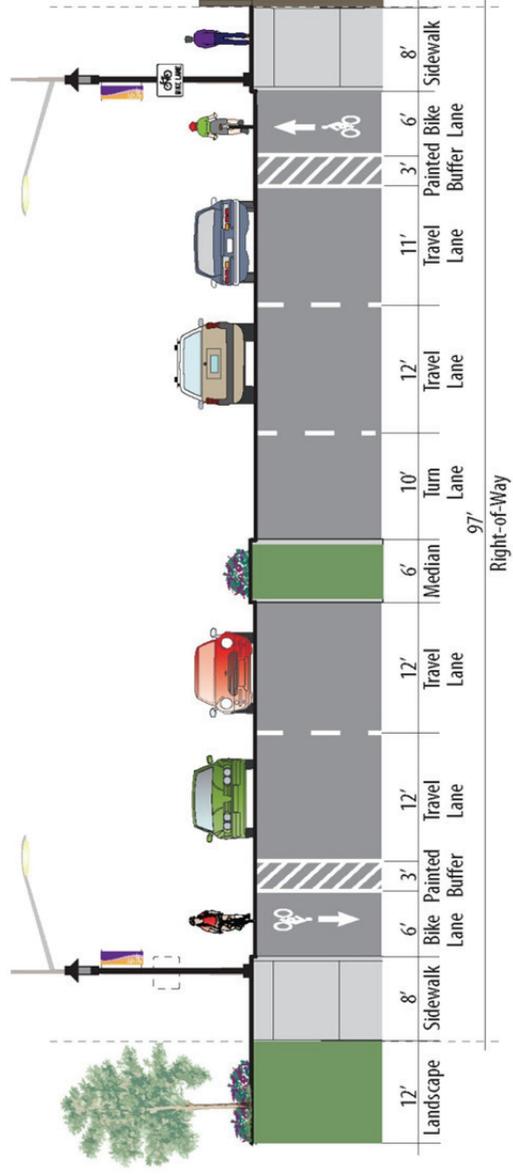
Proposed Bikeway Improvements, Section A – Kanan Road (South)
